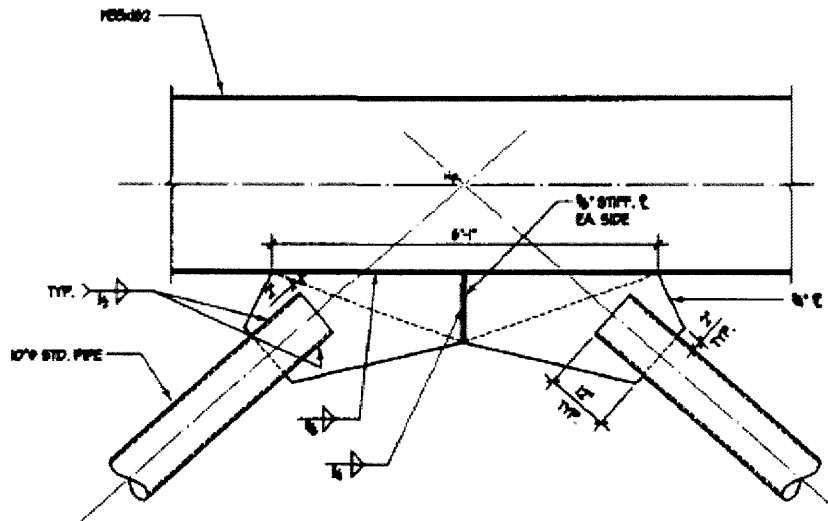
Seismic brace-beam welded chevron gusset connection (Source: Lundeen, 25-7)
